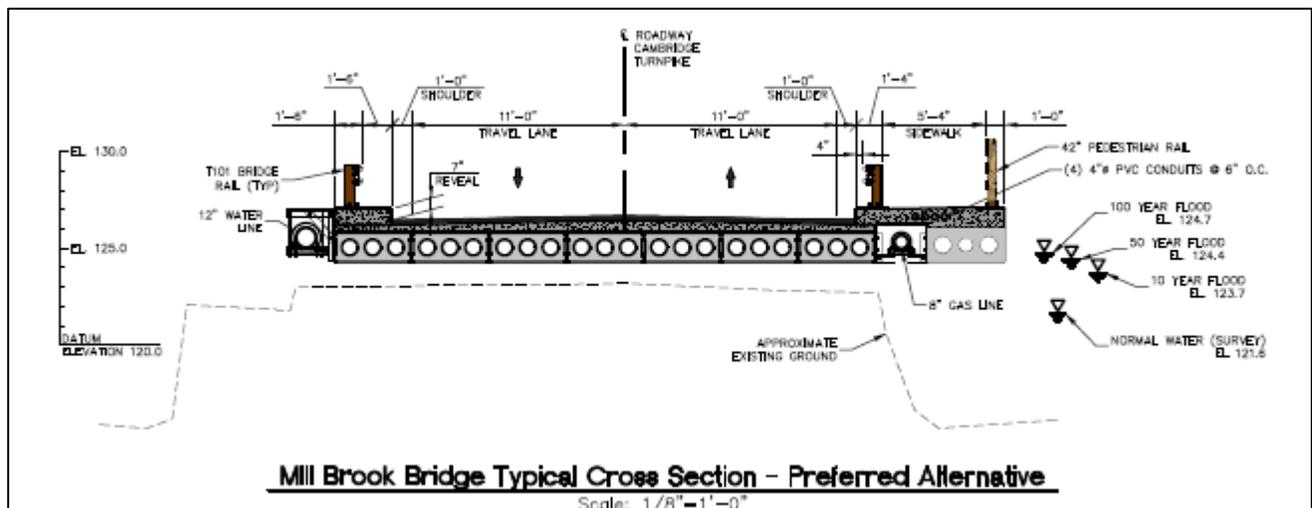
Mill Brook Bridge Typical Cross Section – Preferred Alternative
